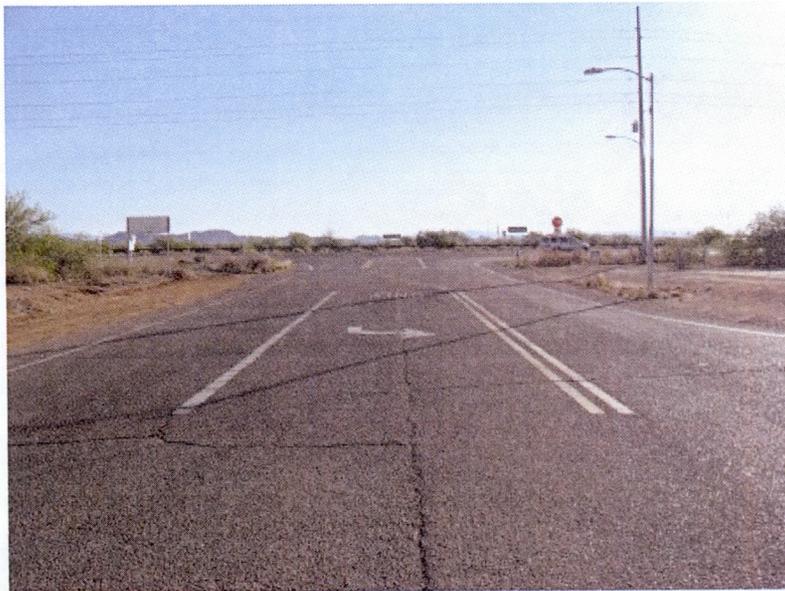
From Intersection of Happy Valley Road and Citrus Road looking NE to Highway.
